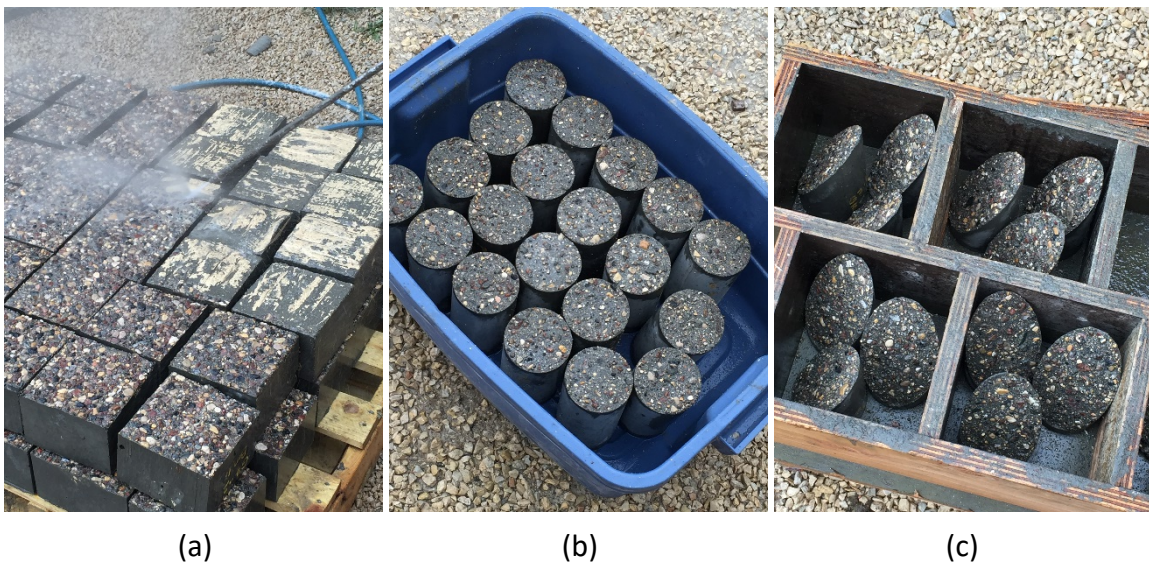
Exposed aggregate surfaces (a) bi-shear; (b) direct tension; (c) slant shear specimens
